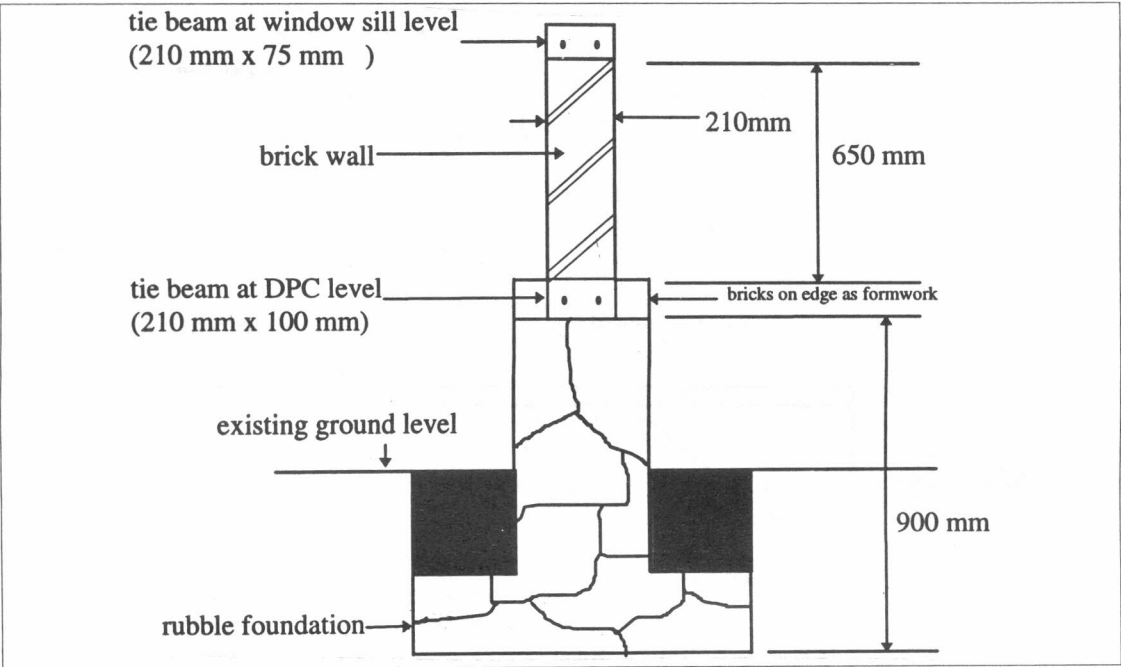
Rubble foundation with tie beams at DPC and window sill levels
